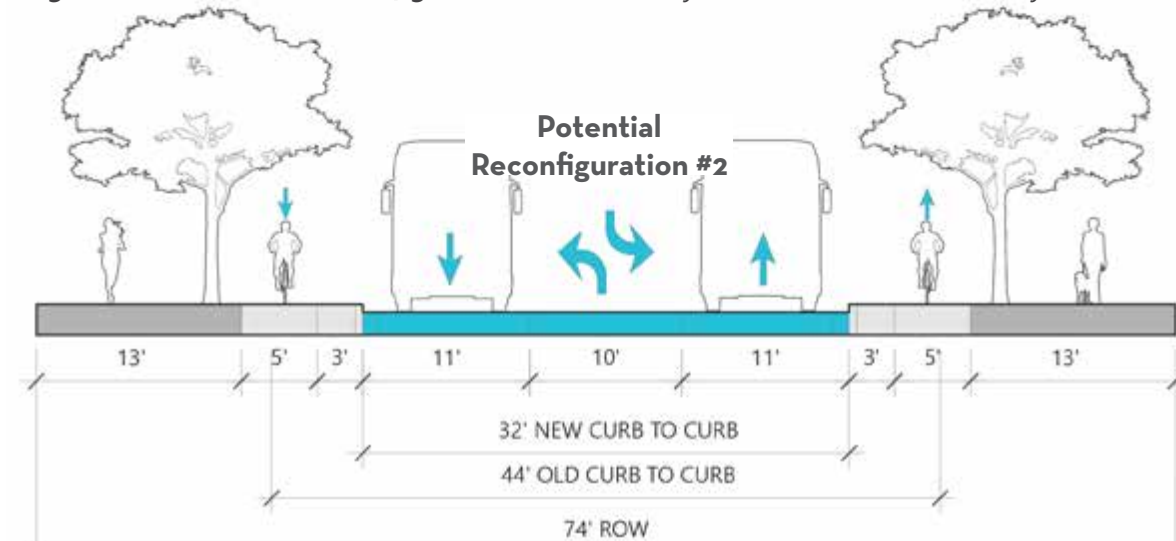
Potential Reconfiguration #2: One-Way, Sidewalk-Level, Class IV Bikeway on a Downtown Collector Street.
